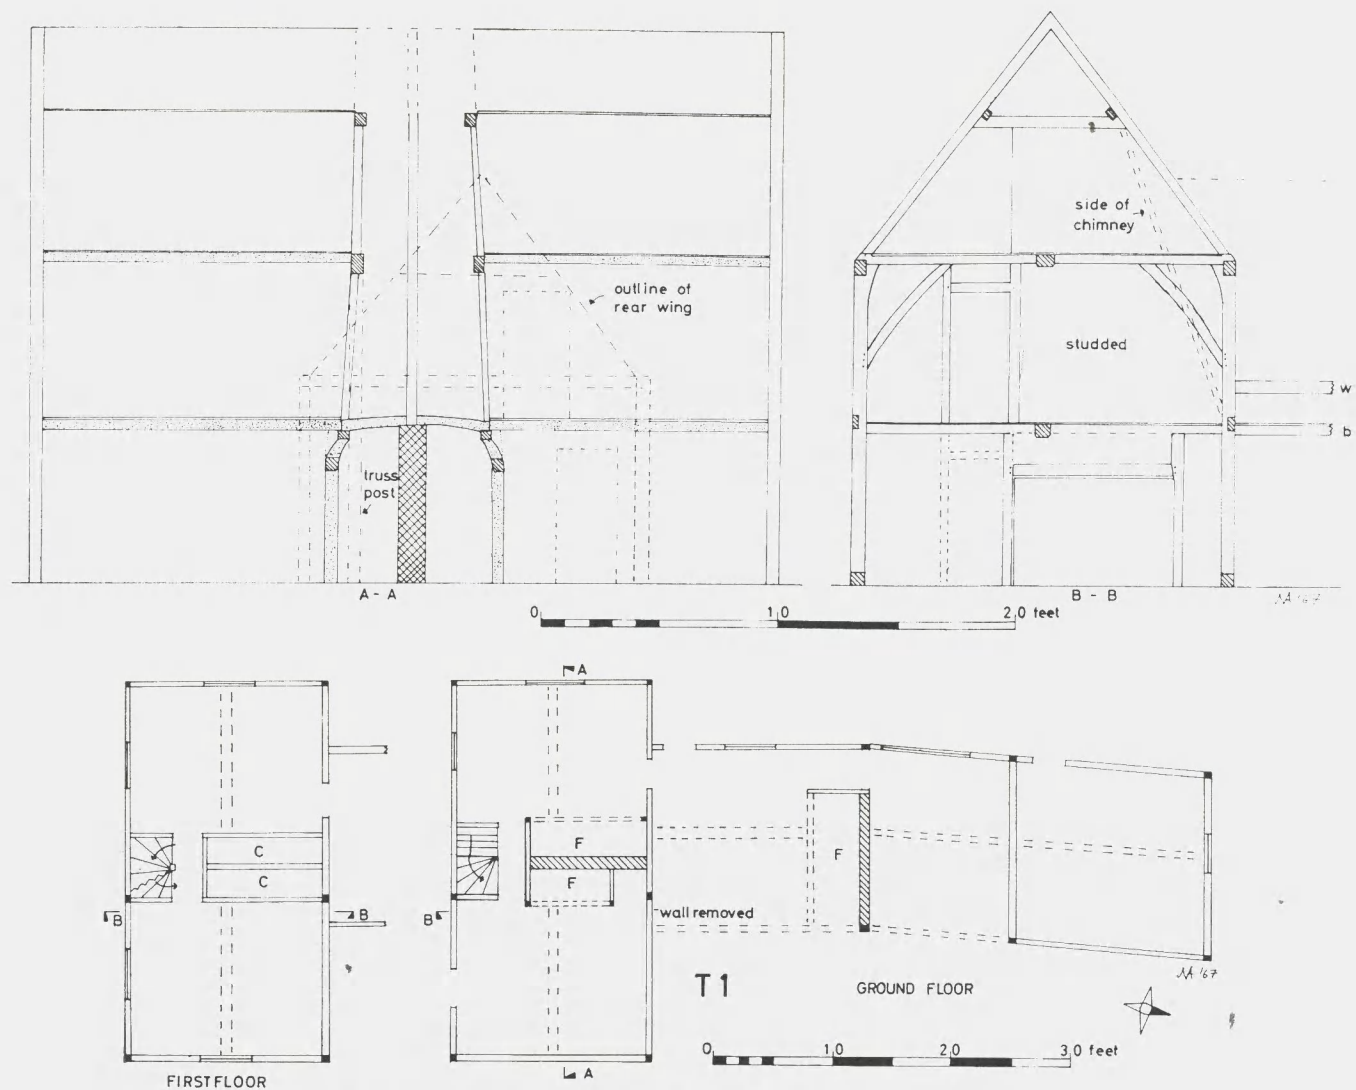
T1: Plans and sections. Shading = stone firebacks, W = wall plate, B = ceiling beam of rear wing.
